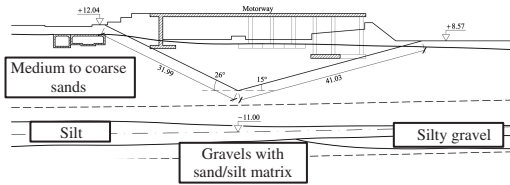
Crossing of the motorway by tunnel construction. Cross-section.
